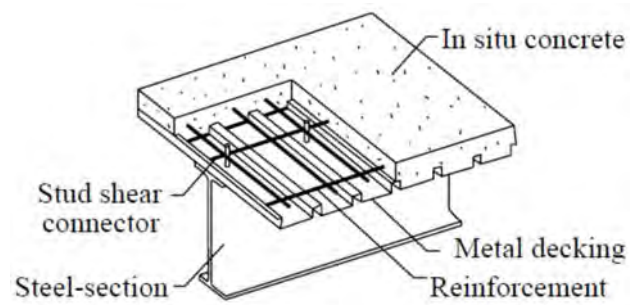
Composite beam with concrete slab on metal deck (Uy and Liew 2002)
